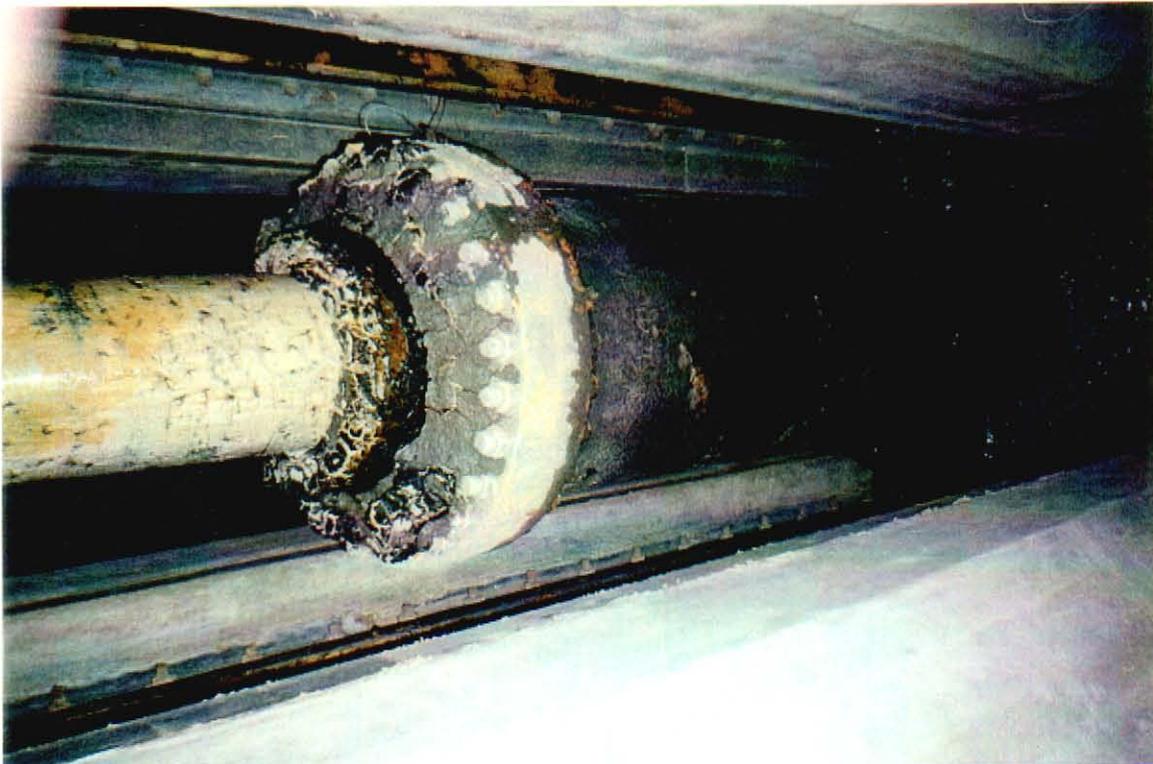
Hydraulic Piping Inside in West Abutment Cylinder Well
